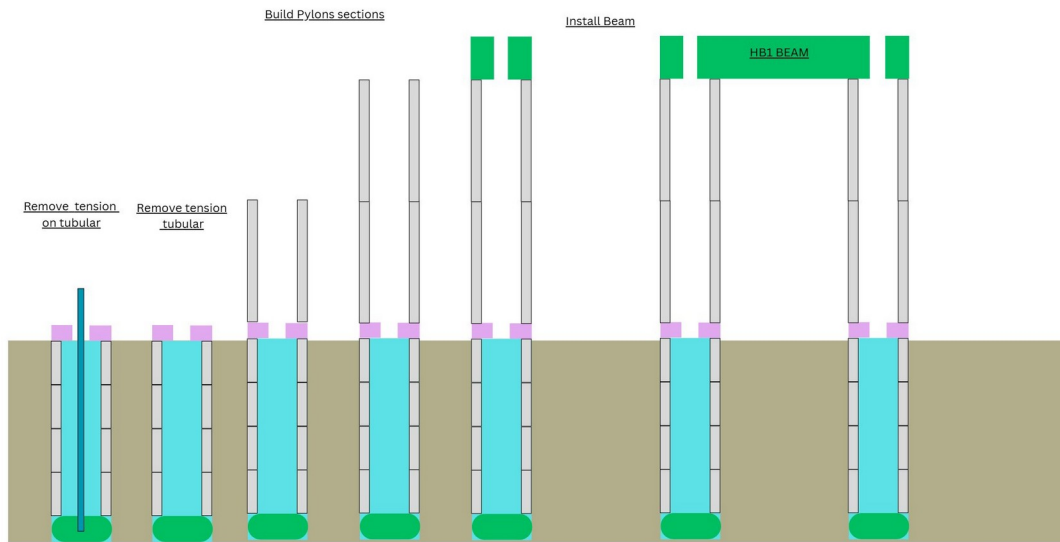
Pylon assembly sequence. Left to right: foundation with tubular under tension; tension removed from foundation tubular; pylon column segments stacked progressively; final segments added to full pylon height; transverse cap beams (green blocks) placed on column tops; HB1 beam installed spanning the column pair — ready for freight deck construction above.
